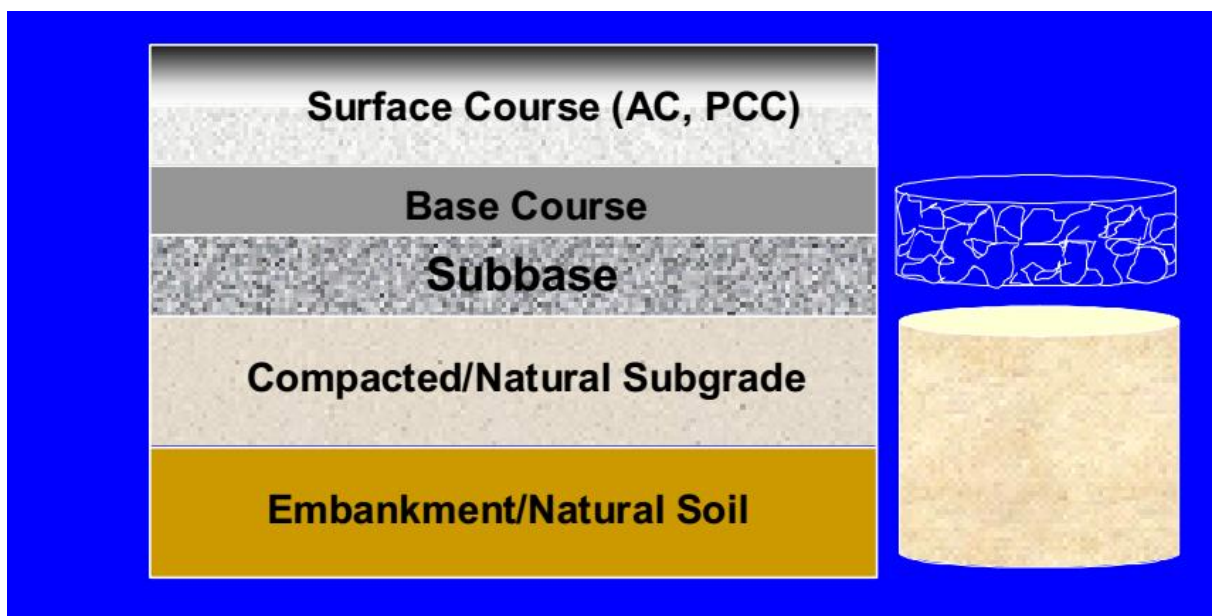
Basic components of a typical pavement system (source: FHWA, 2006).
